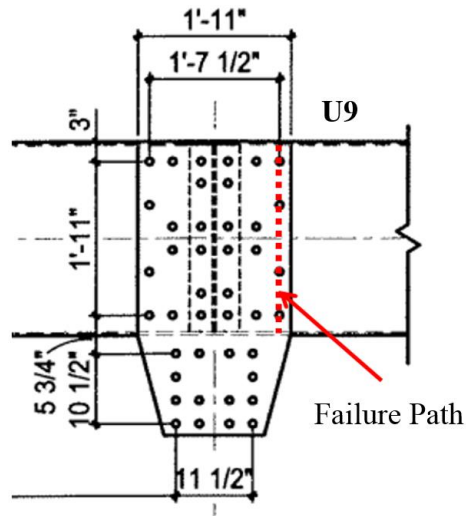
An elevation view of connection U9 of member U8U9. Sverdrup & Parcel and Associates Inc. (1965). State of Minnesota Department of Highway Construction Plan for Bridge No. 9340 – Balance of Bridge and Approaches. St. Louis, MO. Used under fair use, 2015.
